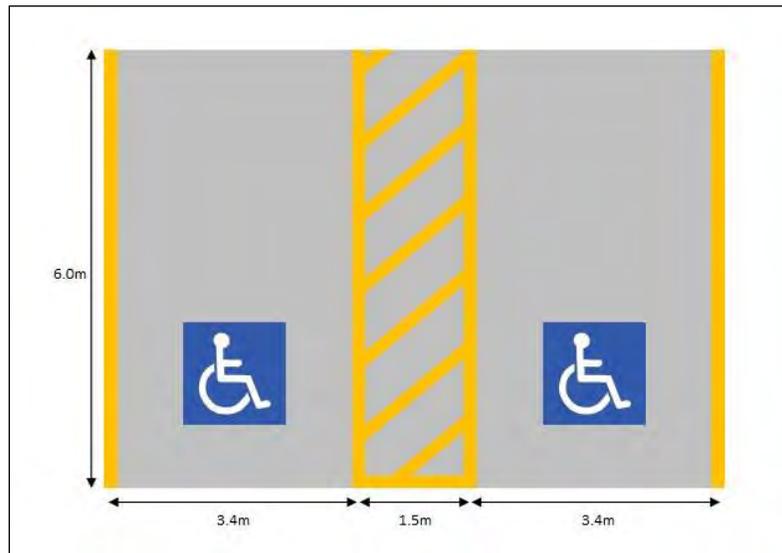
TWO BARRIER-FREE PARKING SPACES WITH AISLE.
